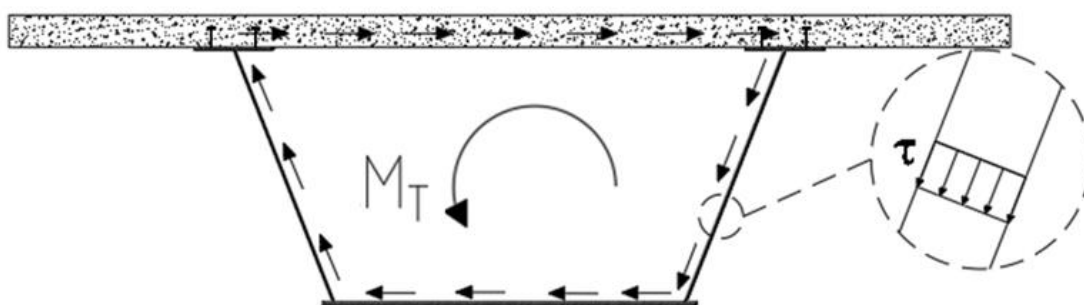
Shear flow for a closed cross-section in a steel-concrete composite box-girder.
